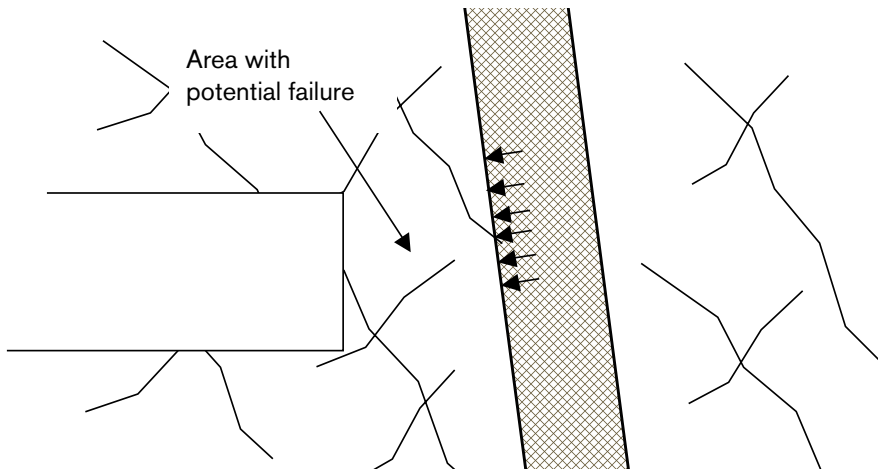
Area of potential failure between the water-bearing fracture zone and the tunnel face.
